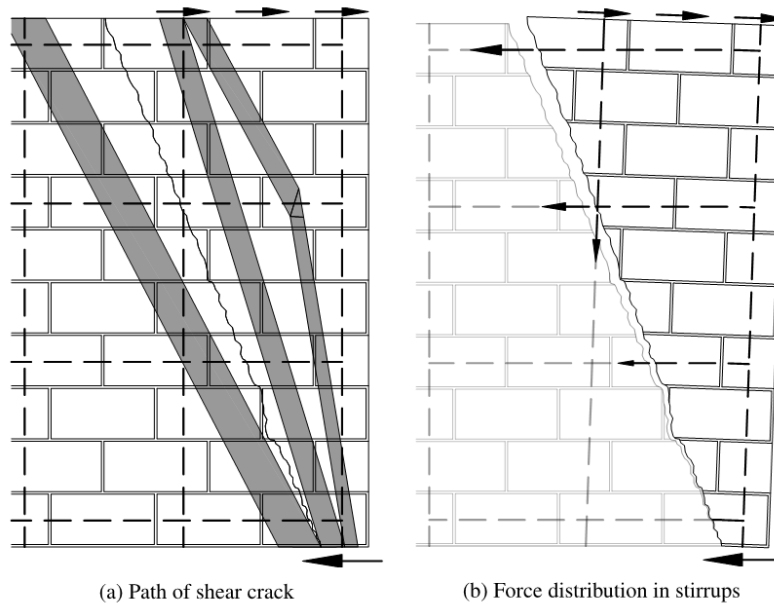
Behaviour of horizontal reinforcement in a shear wall (Dillon 2015)
